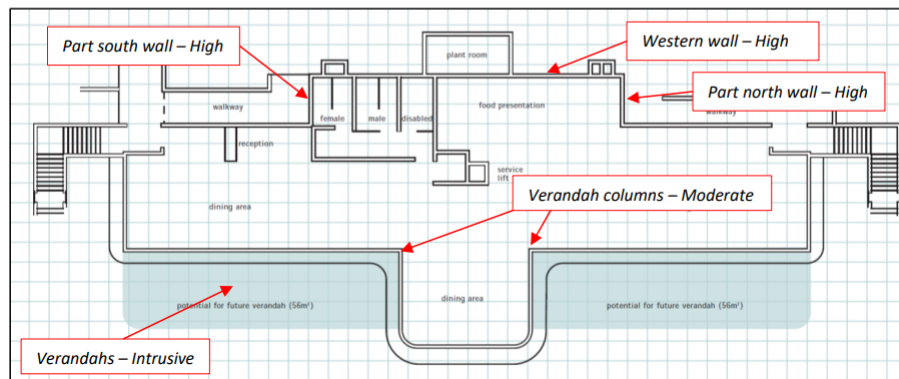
Location of significant elements at the second floor of the pavilion (MBRC 2006: 9).
